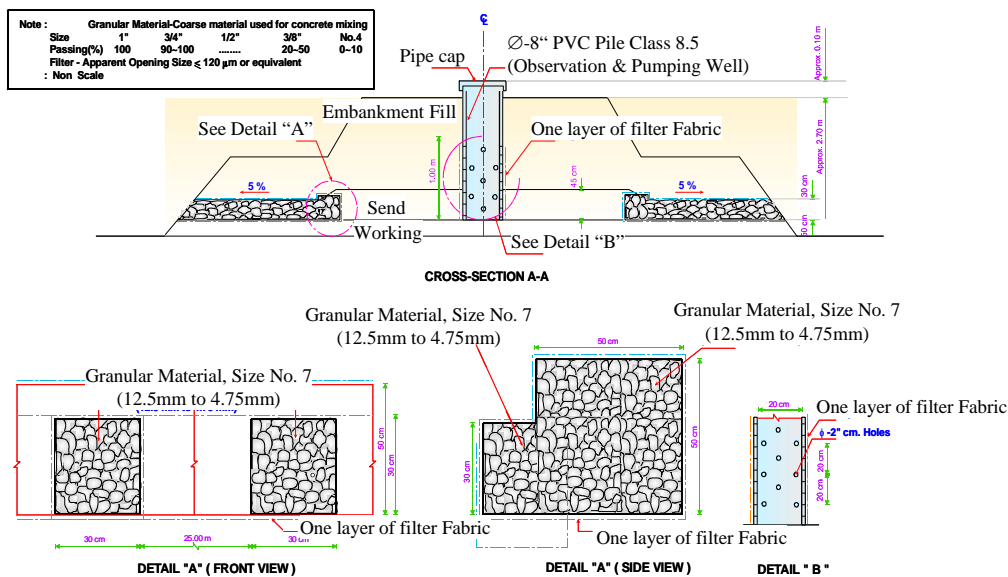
Typical Cross – Section of additional trenches and pumping wells in BCNH
